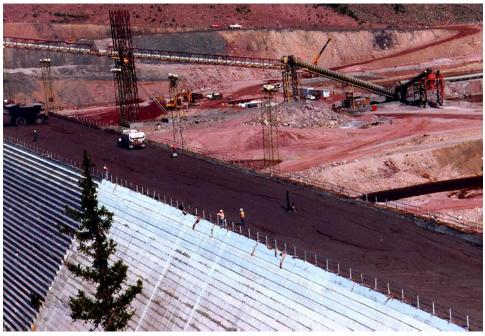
Photograph of the downstream face of Upper Stillwater Dam and the conveyor layout during construction.
